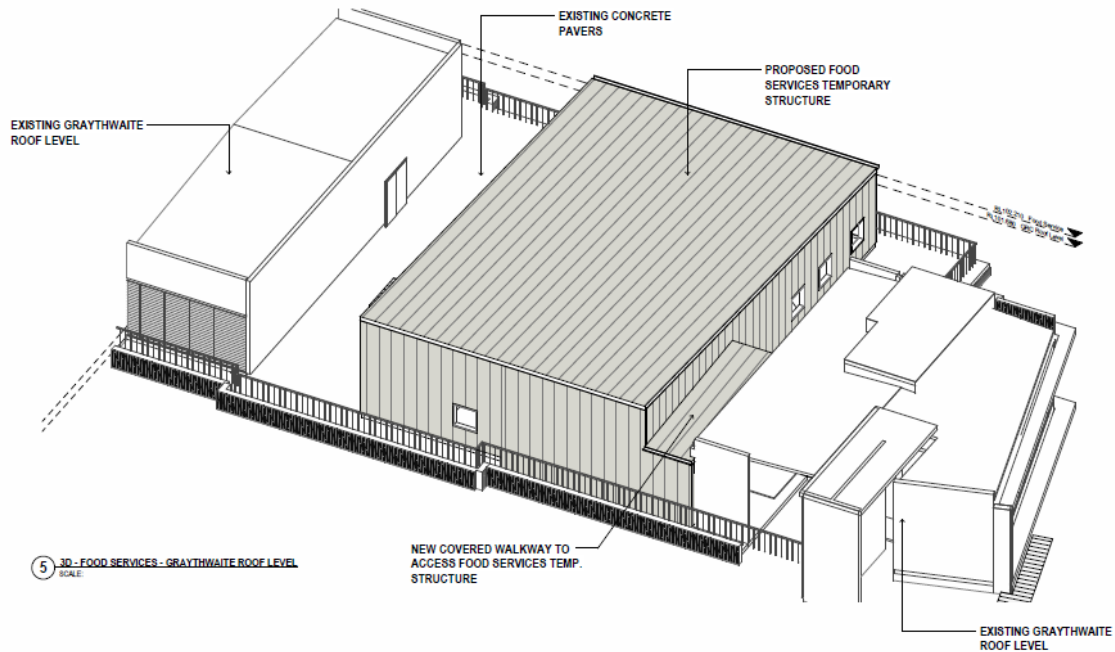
Addition to Level 03 of Graythwaite – 3D showing relationship to existing structures.
